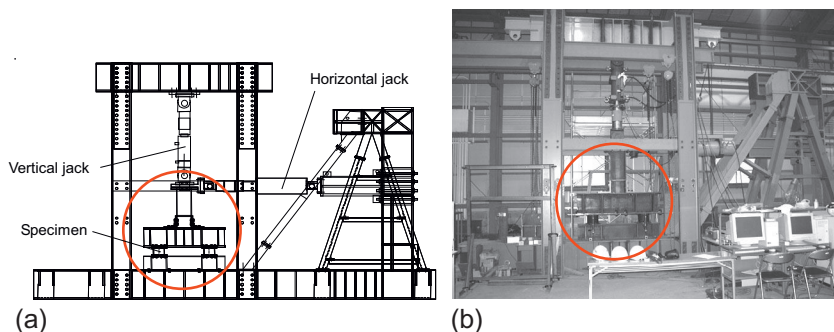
Test setup: (a) test specimen and loading frame, (b) view of test setup.
